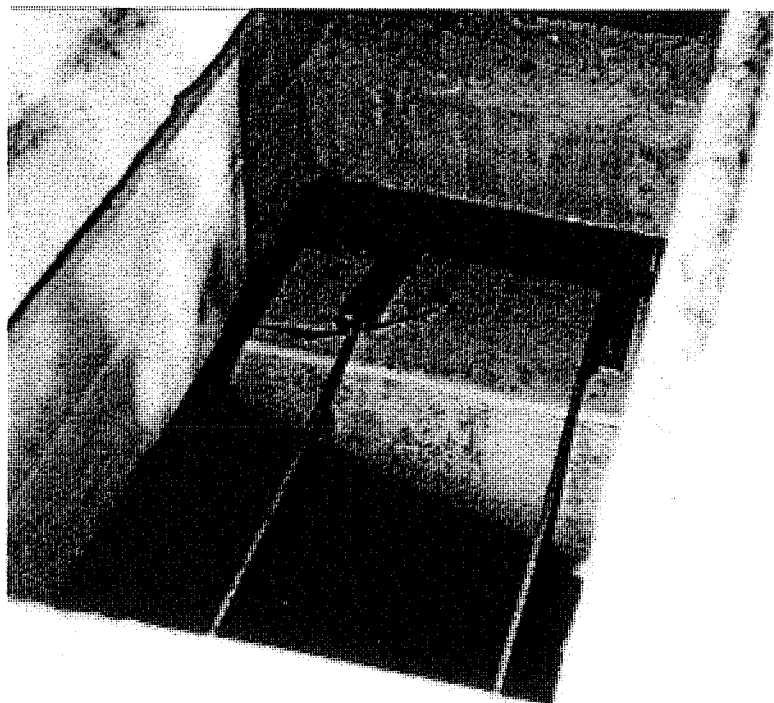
Yuile Street ILLS prototype (following surcharging event) with boom hanger failure and boom against pipe outlet (Authors photograph, January 1998).
